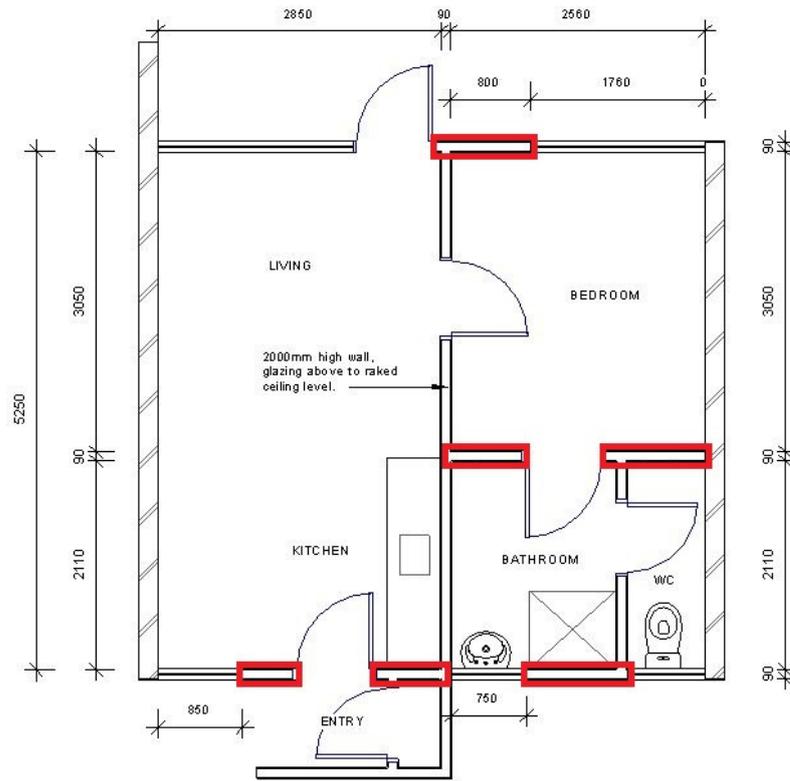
Walls used for bracing in the longitudinal direction, single unit.
